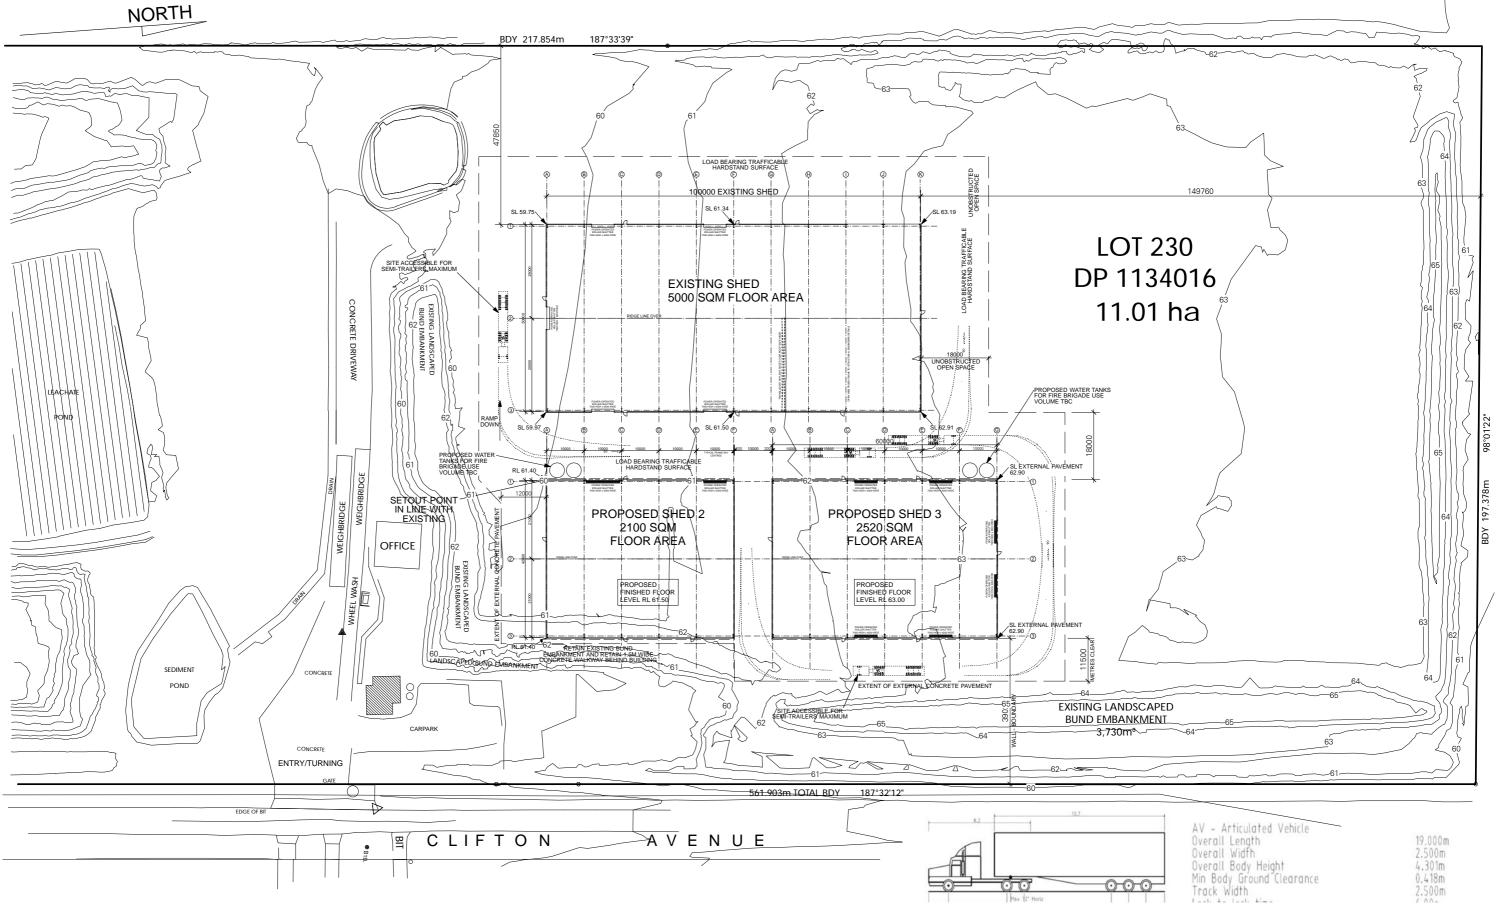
Proposed site plan (Source Apex Building Systems Pty Ltd).
